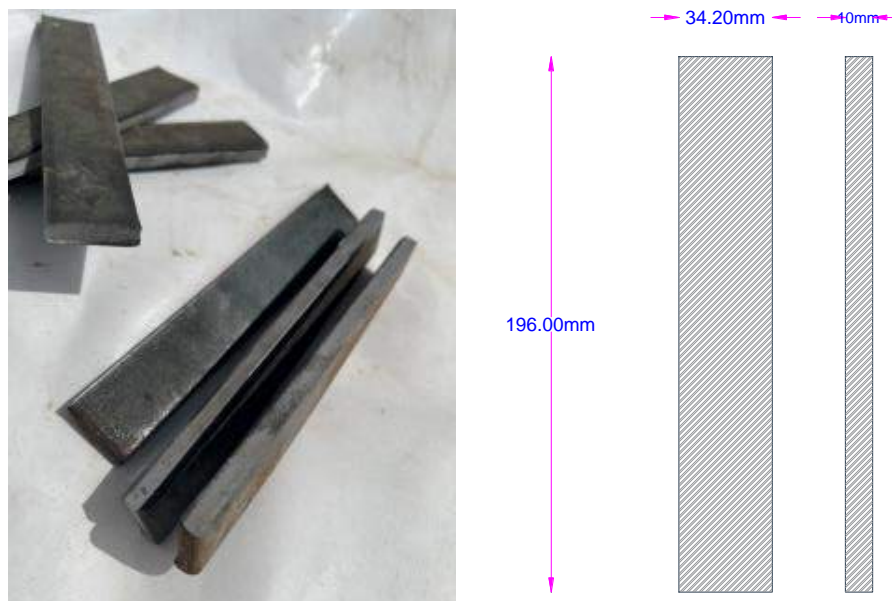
Dimensions and Details of Stiffeners to Reinforce Castellated Beam.
